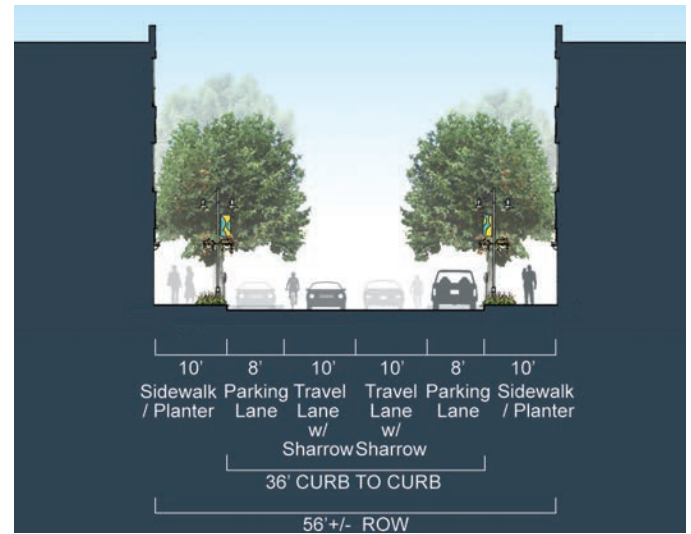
RESIDENTIAL STREET - SECTION OF POTENTIAL ENHANCEMENTS
